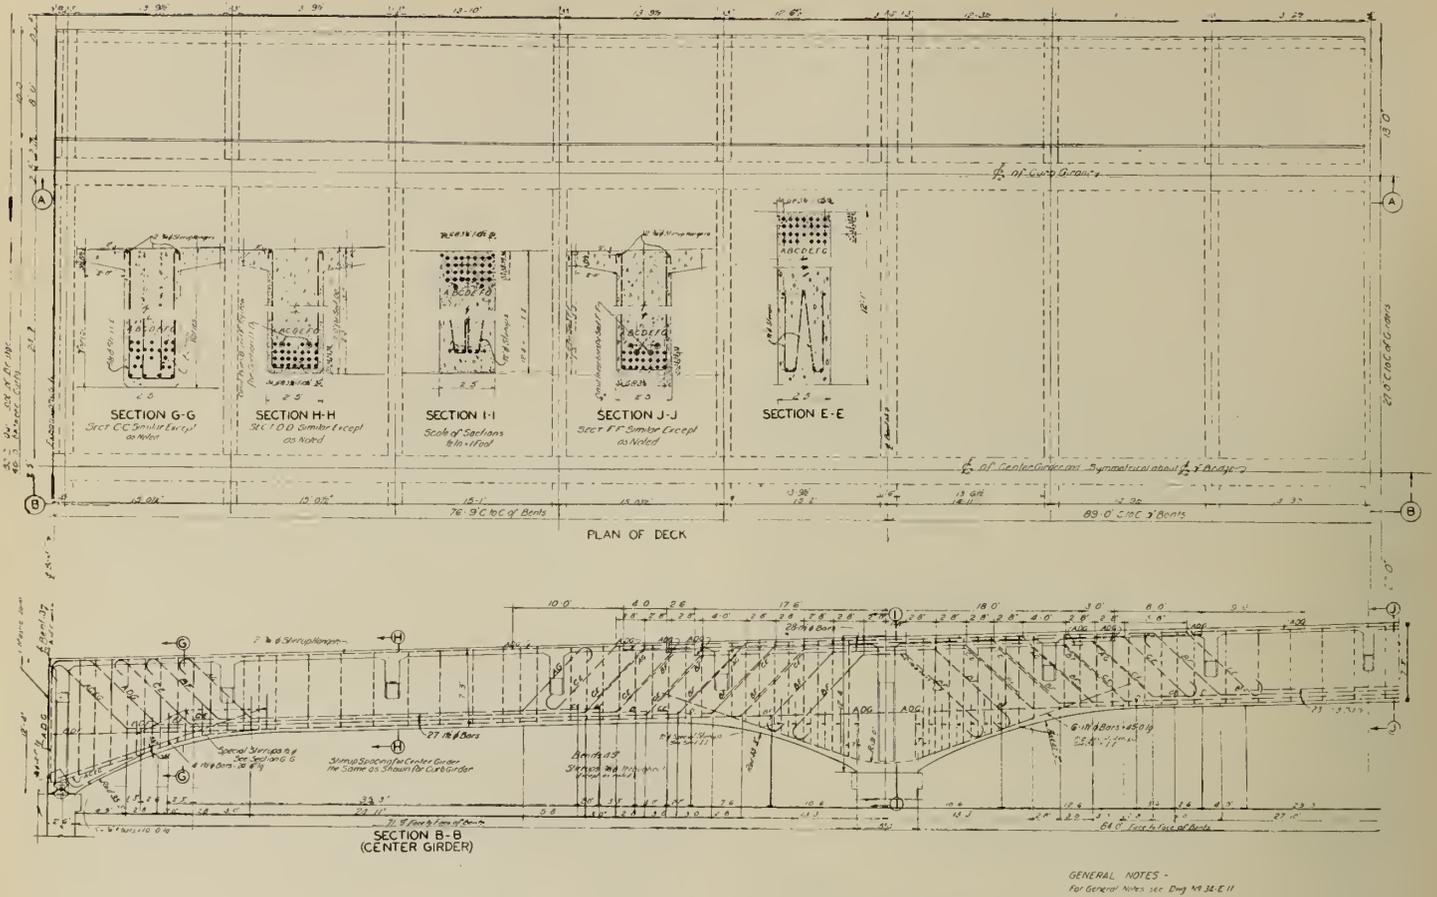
Concrete Viaduct—Typical Centre Girder and Deck.
